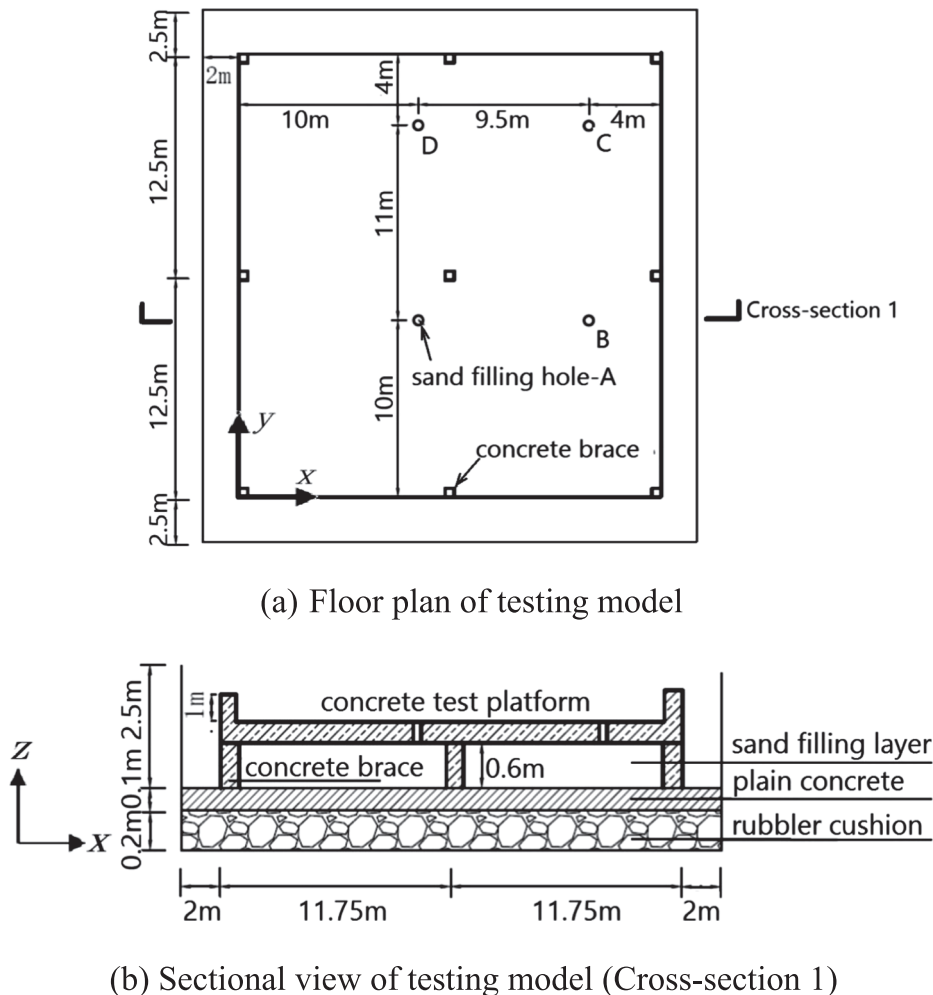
Full - size testing model of immersed tube tunnel (cross-section).
